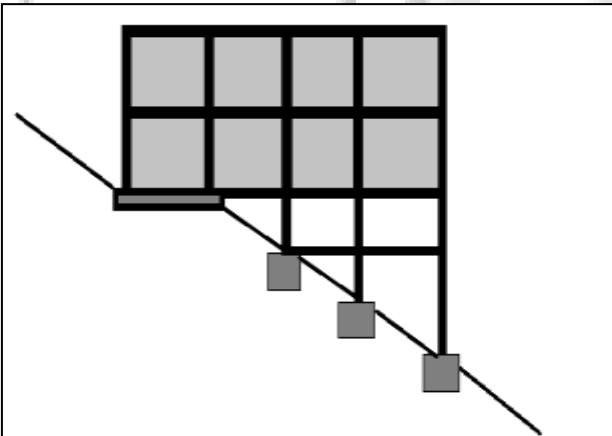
Parts of the building supported by stilts on the downhill side
